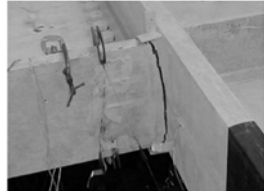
Beam top flange fracture during 0.75% drift cycle in Specimen EC03
